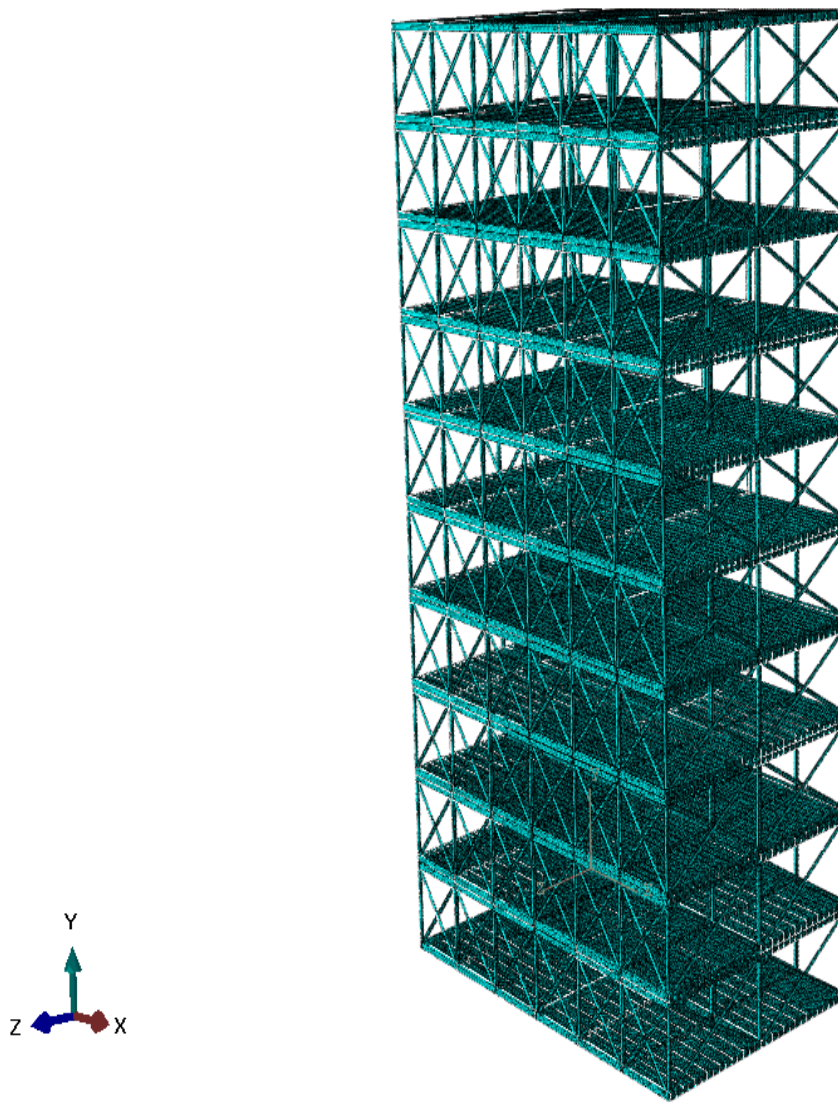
Full scale FE model development of high rise modular building supported with bracings
